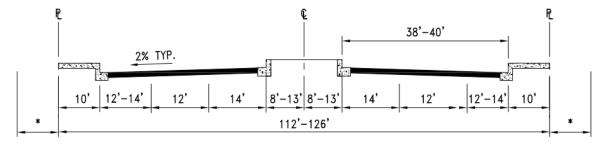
Existing Typical Section for Primary Arterial (Commercial Street)
